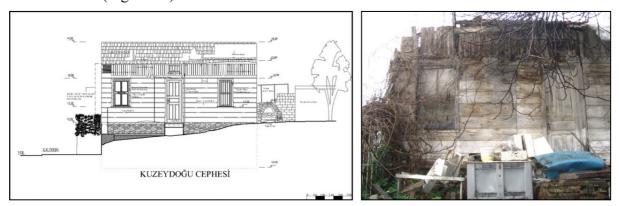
Drawing and Photo of Northeast Facade (Tanrıverdi, 2011)
